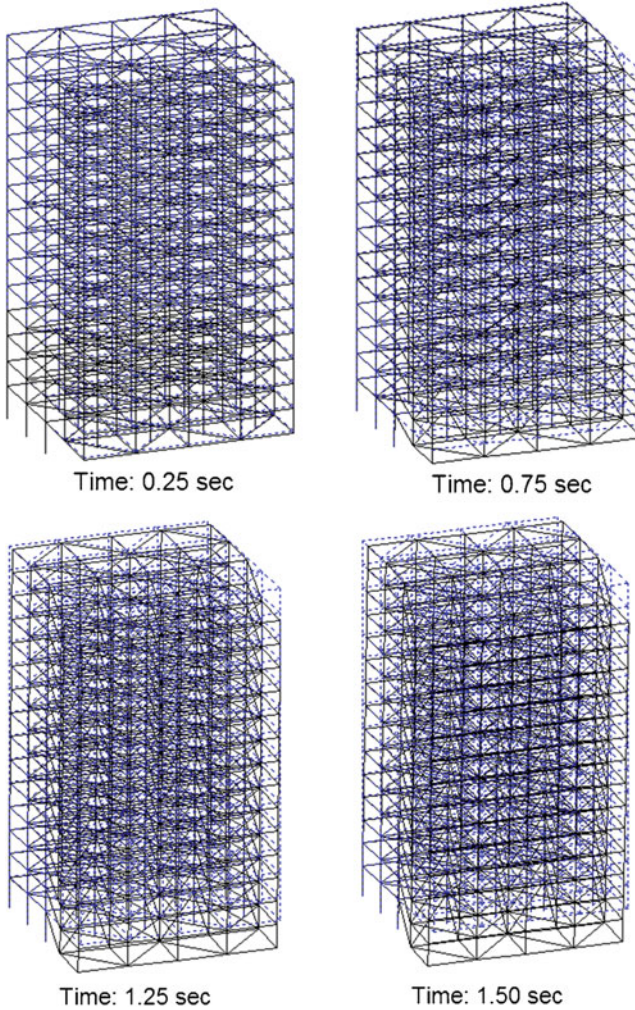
Deformed shape of the building as collapse progresses in bird view
